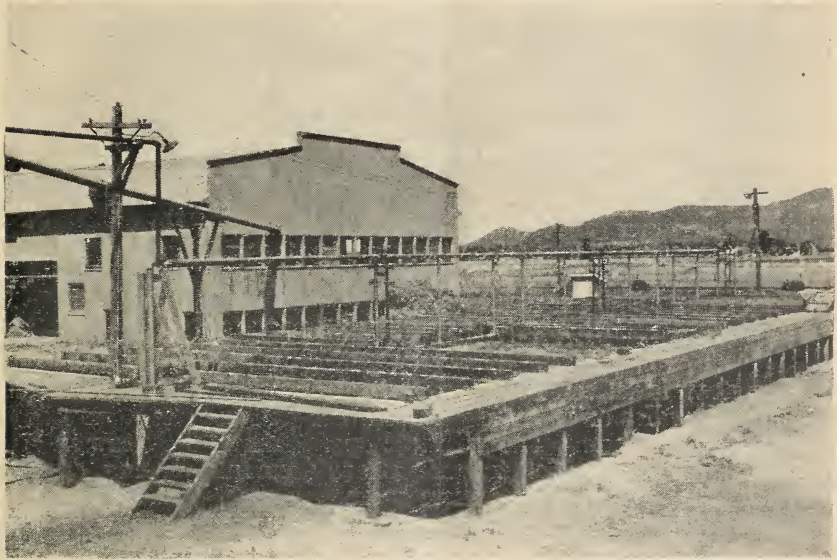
A battery of six retting tanks surrounded by a catwalk. Note water supply pipe overhead and mill building in background.
